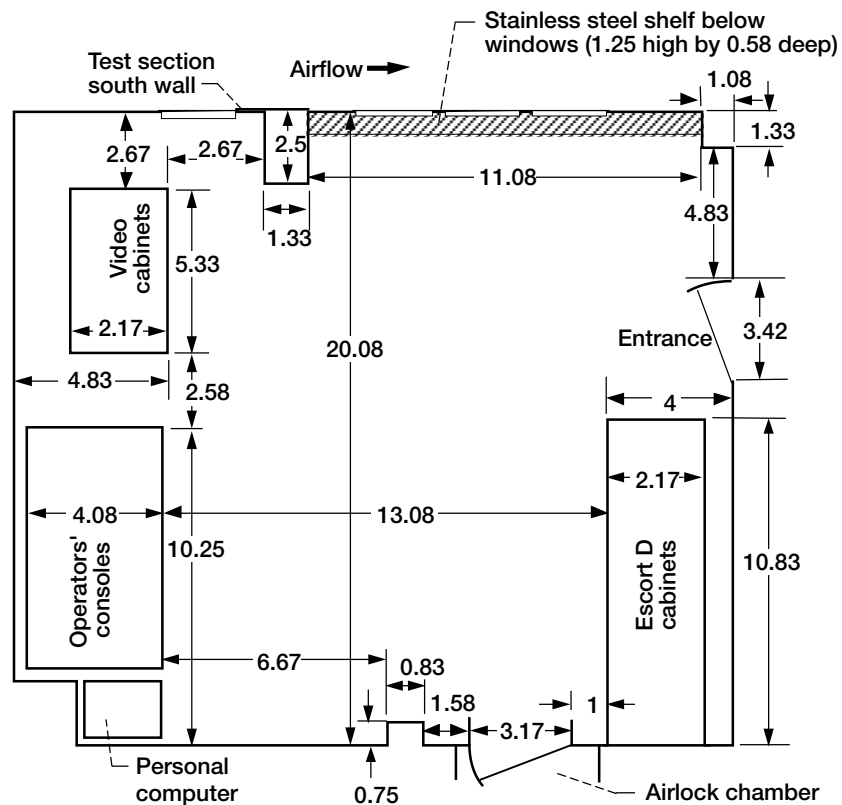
Floor plan of IRT primary control room. All dimensions are in feet.
